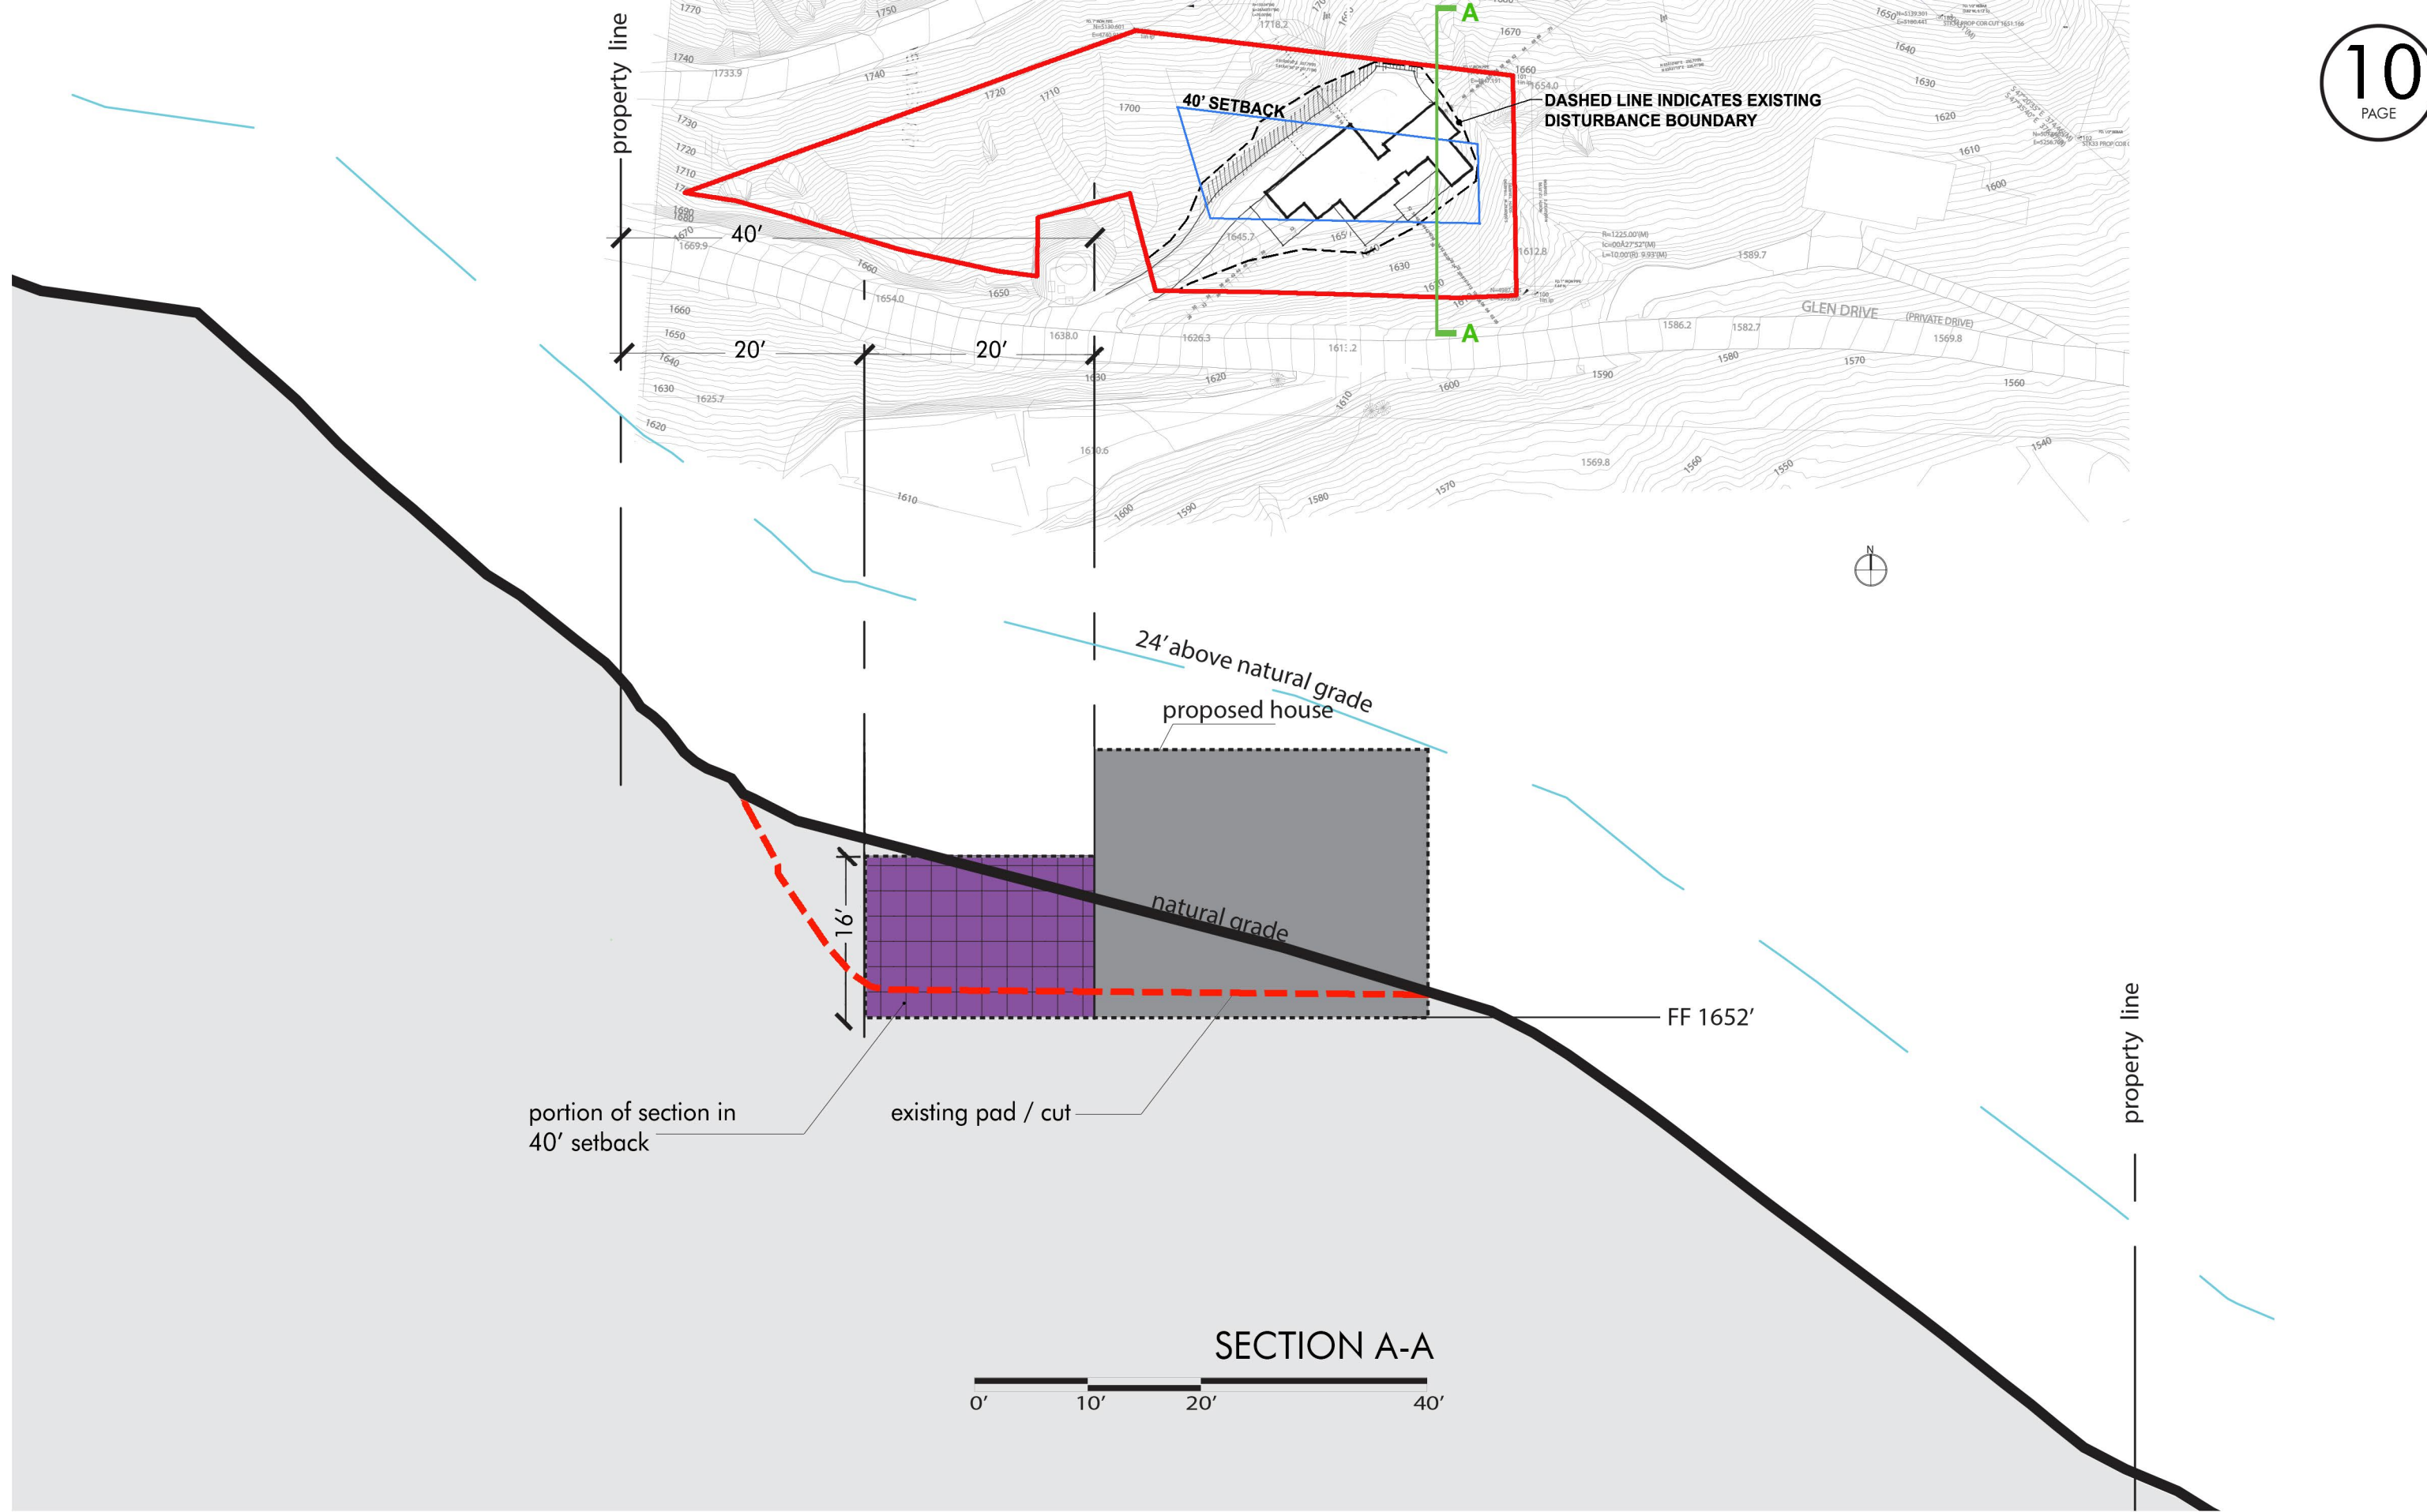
EXHIBIT H - PROPOSED SECTION WITH 24' HEIGHT LIMIT
